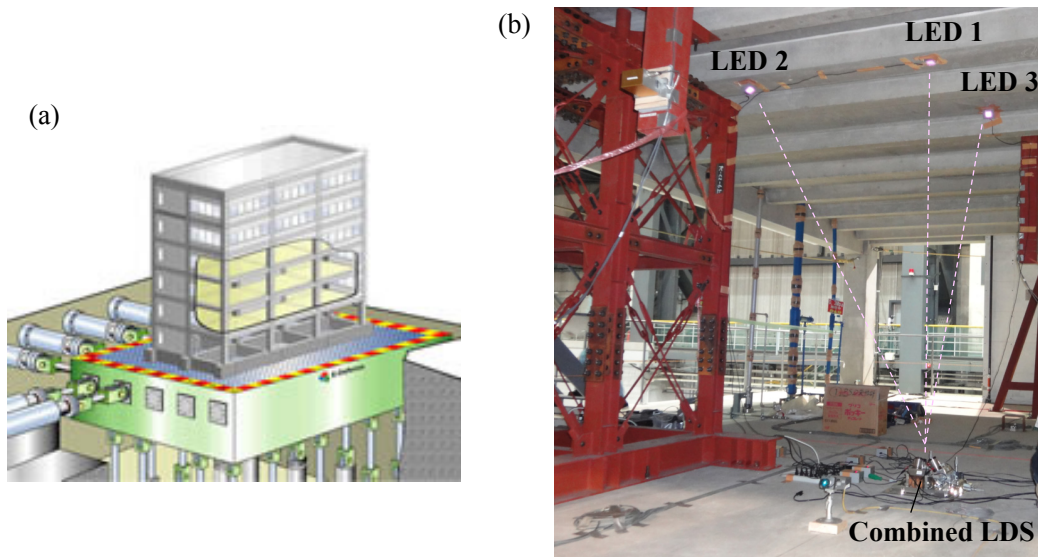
Full-scale earthquake testing for the building fracture experiment in the E-Defense. (a) A full-scale building on the three-dimensional shaking table. (b) The 5-DOF relative-story displacement sensor installed in a full-scale building.
